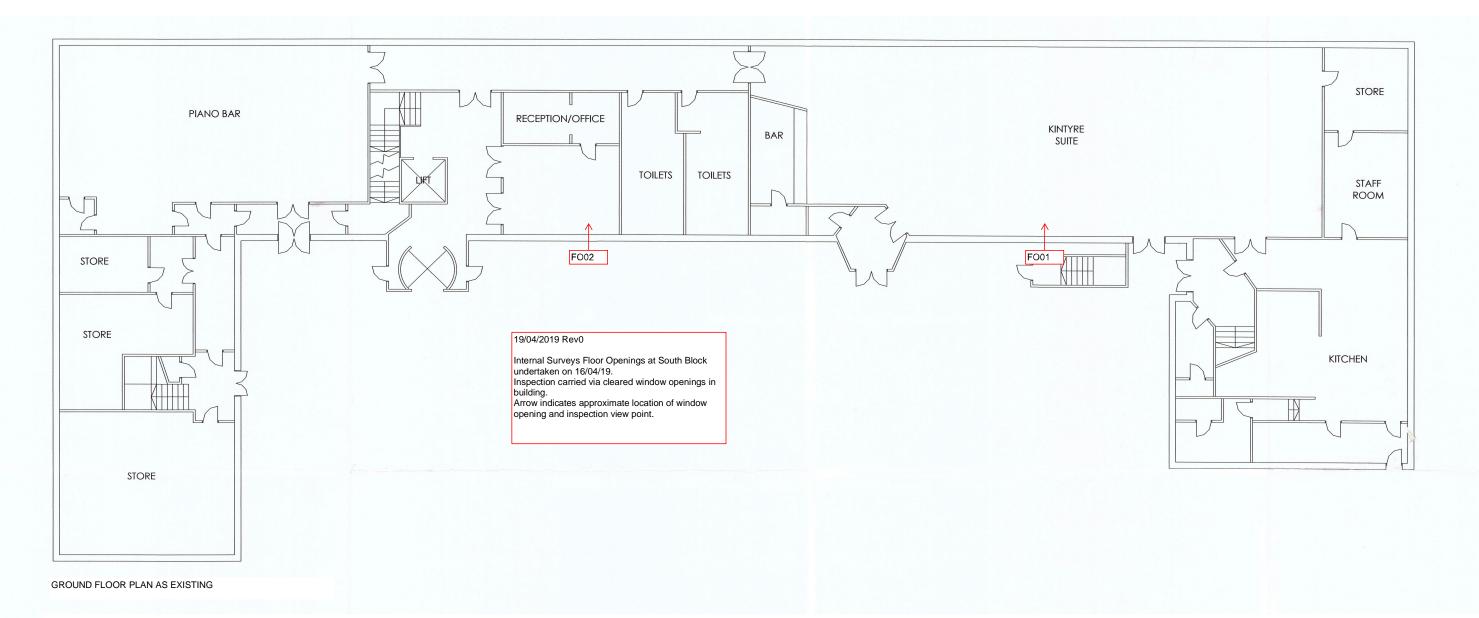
Plan of Station Hotel Building South Block Ground Floor showing Internal Survey Floor Openings Defect/Observation Locations
